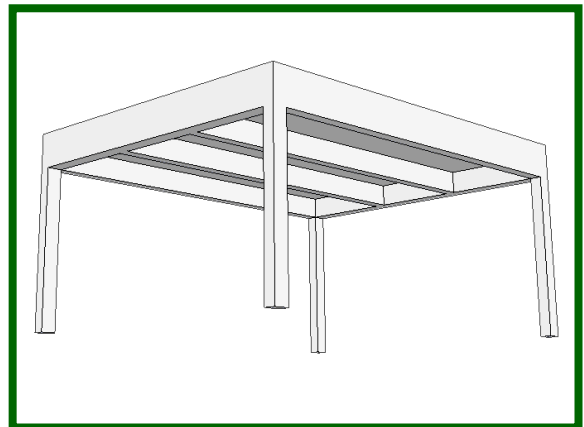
A sketchup model of the layout of the one-way slab system.
